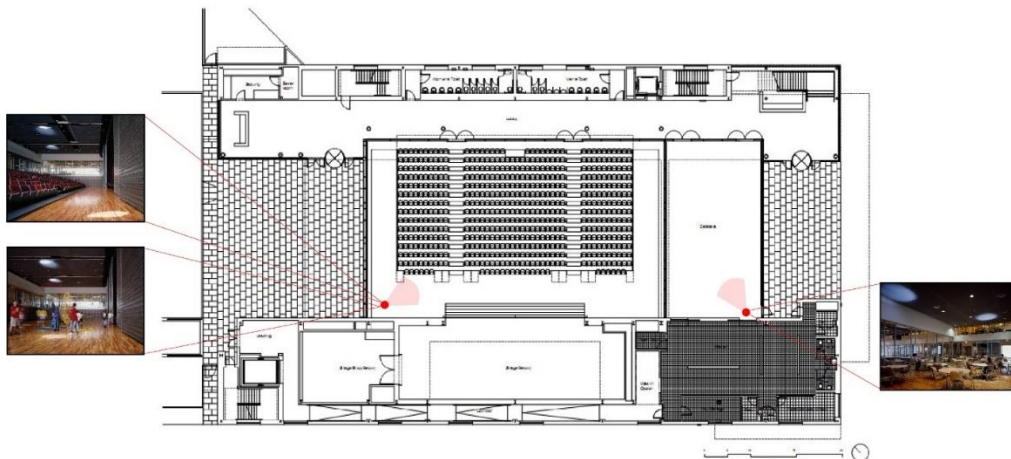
Level floor plan of Gary Comer Youth Center designed by John Ronan Architects in 2006. (Hall and Blessin, 2006). <https://www.archdaily.com/189411/the-gary-comer-youth-center-john-ronan-architects>
